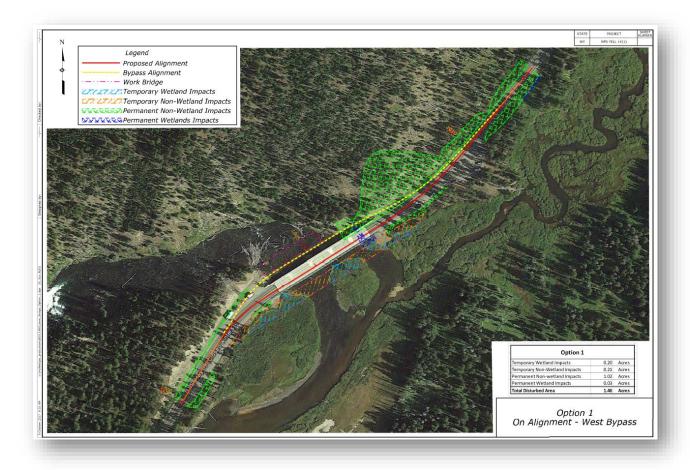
Replace bridge on existing alignment, with temporary bypass bridge to west.
